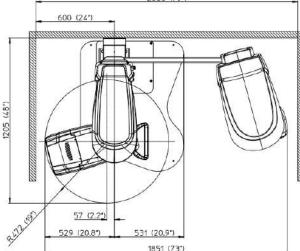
X-MIND prime 3D dimensions – Free-standing version
